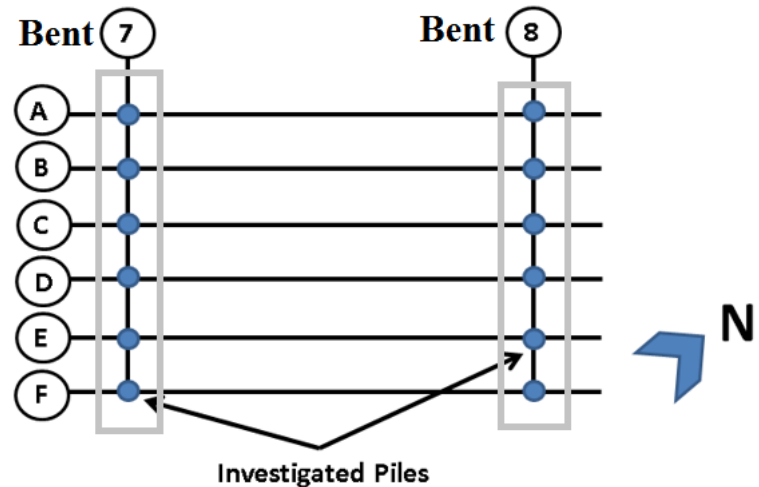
Foundation Plan and Investigated Piles of Santo Domingo Bridge
